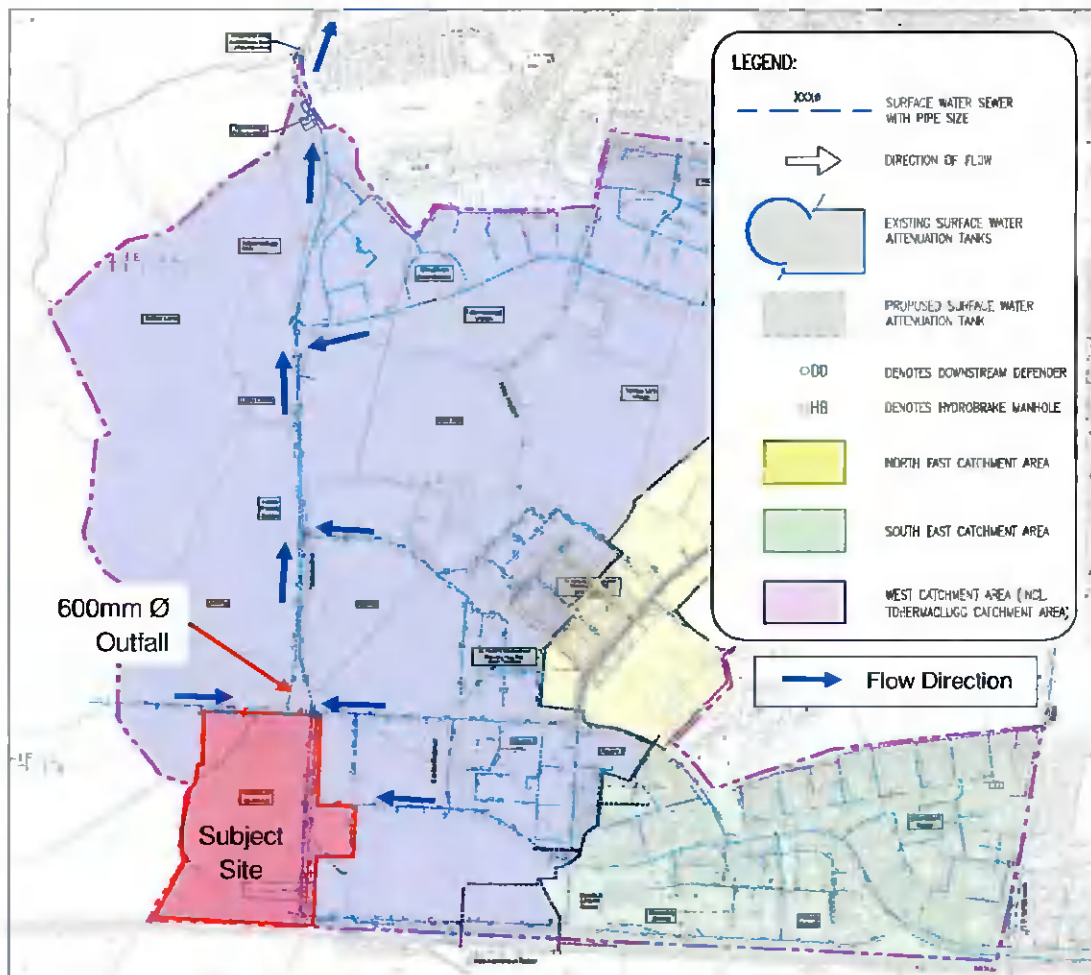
Existing Stormwater Drainage Installed within ASDZ
